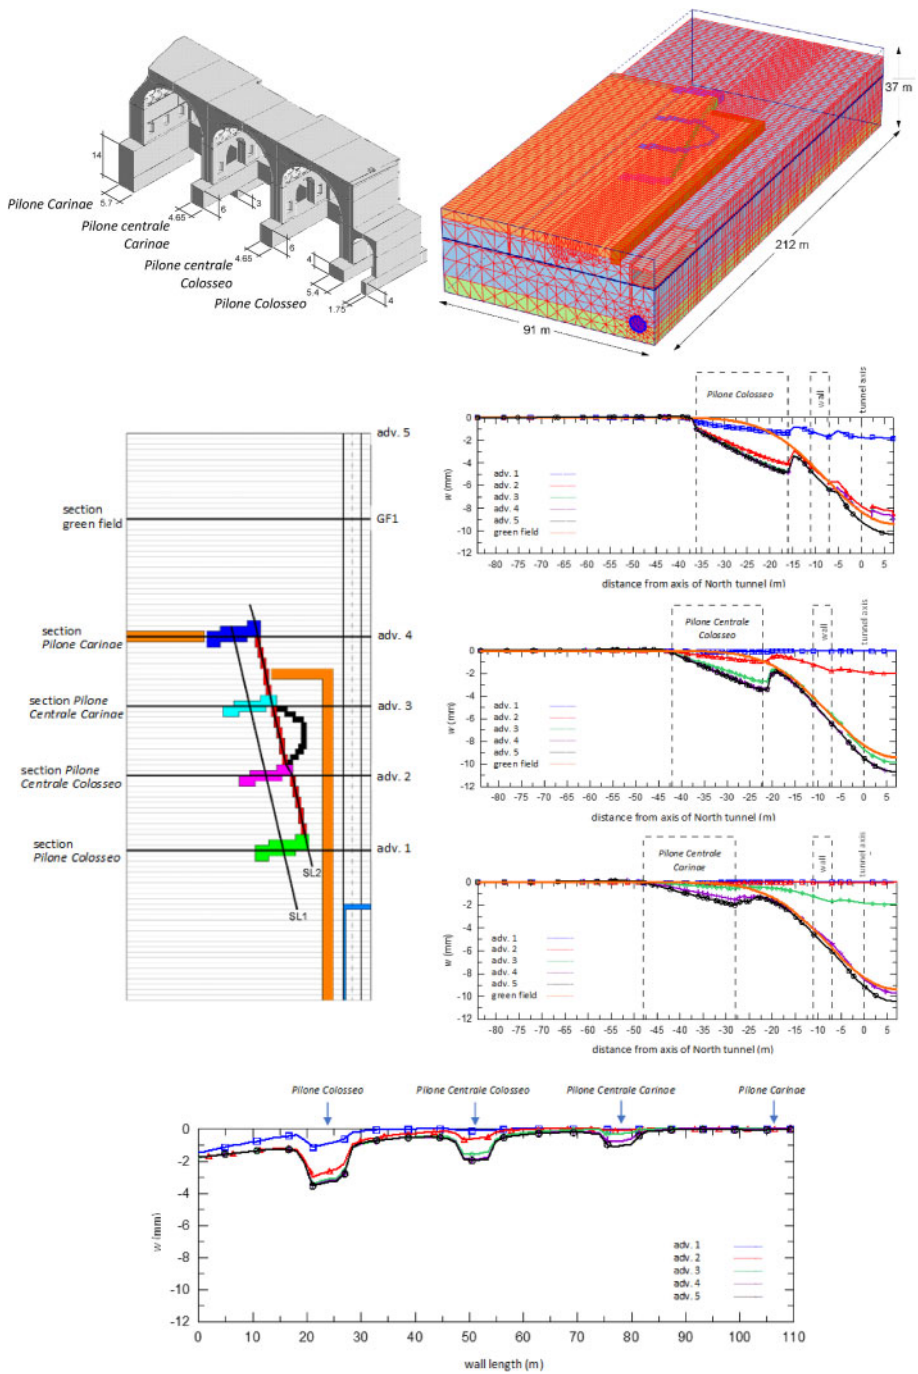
Basilica di Massenzio*: (a) foundations geometry; (b) 3D numerical model; (c) plan view of the model with tunnel advancements; (d) settlement profiles with tunnel advancement for the bearing piers; (e) settlement profiles with tunnel advancement along SL2 section.
